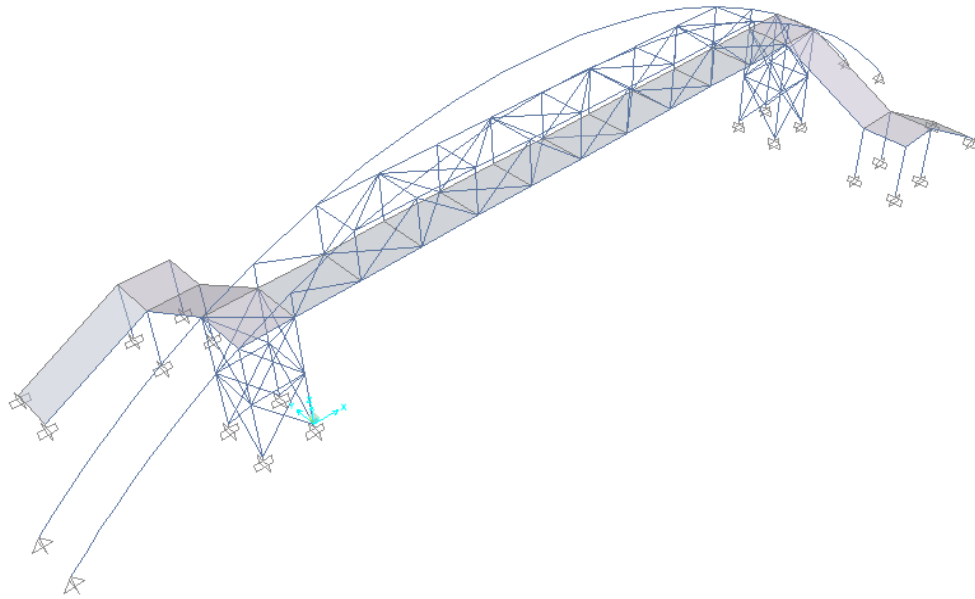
Model of the single span truss bridge (Capstone Project) in SAP2000
